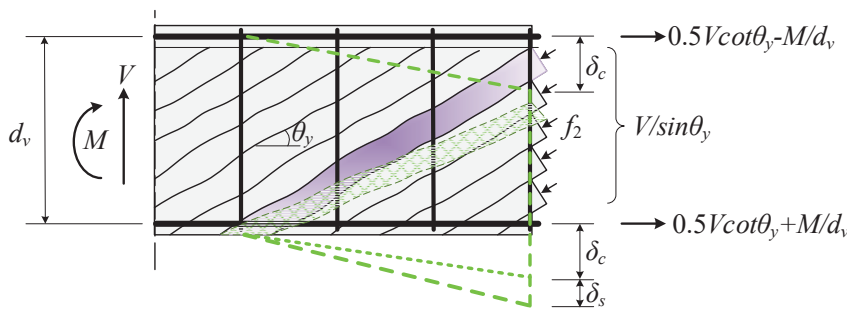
Truss model for shear response of diagonally cracked RC beams.
